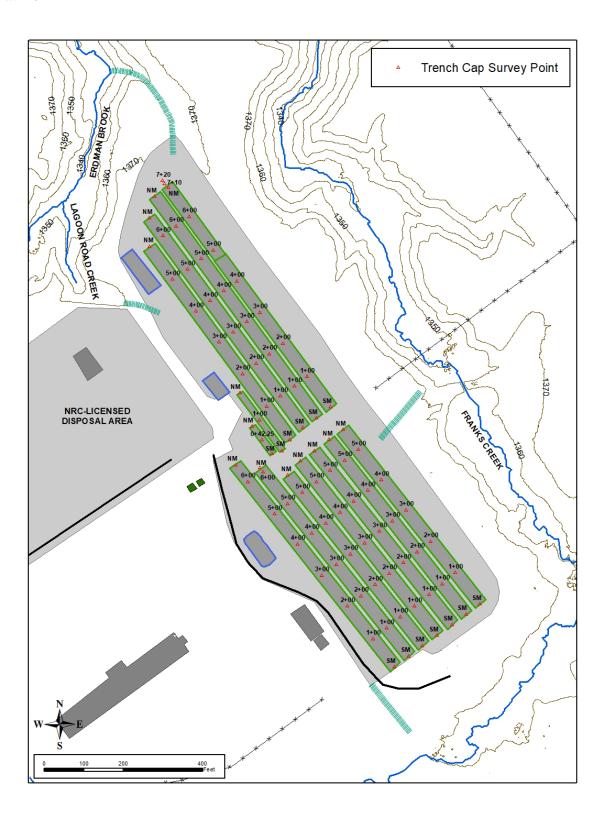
Trench Cap Ground Surface Elevation Survey Points
